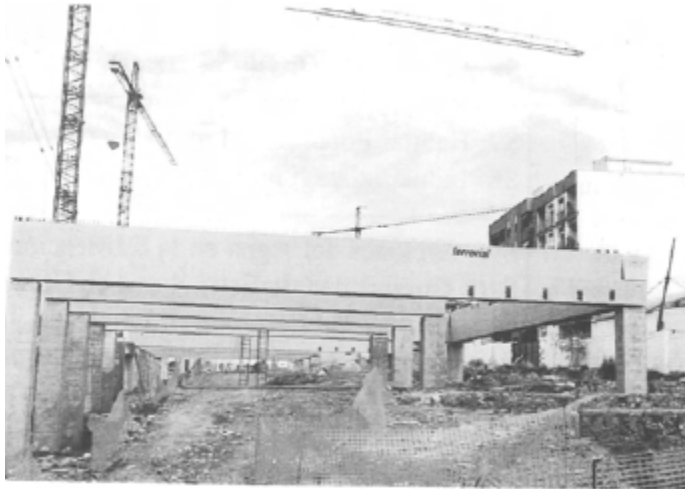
Prestressed precast beams. Architect: Juan Navarro Baldeweg
